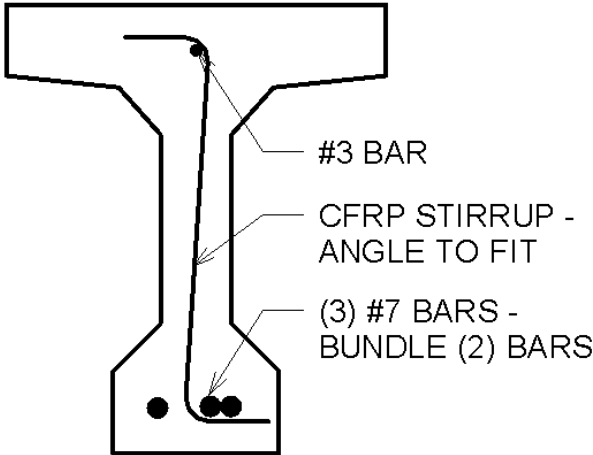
Cross-Section of Specimen 3 CFCC Reinforcement
